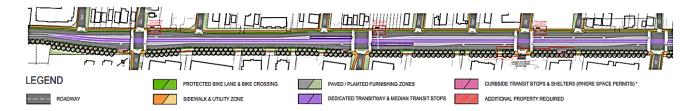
LAKESHORE ROAD EAST – ROLL PLAN EXCERPT (LAKESHORE CONNECTING COMMUNITIES TRANSPORTATION MASTER PLAN: CITY OF MISSISSAUGA / HDR)
